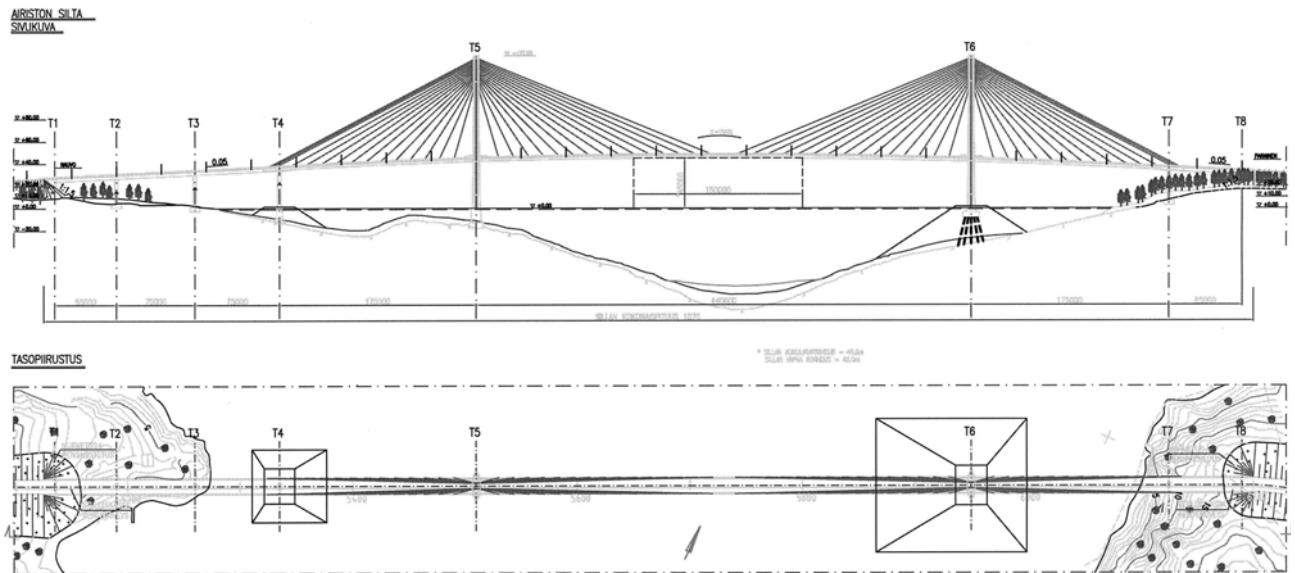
Airisto Cable Stayed Bridge including protection islands for pier T4 and pylon T5
